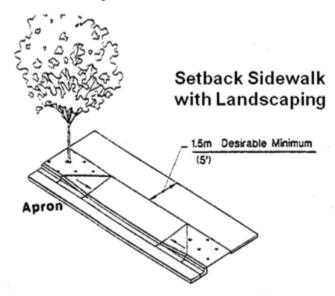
Applicant's driveway, planter strip, and sidewalk proposal matches the example seen in Figure 10-35(2).
